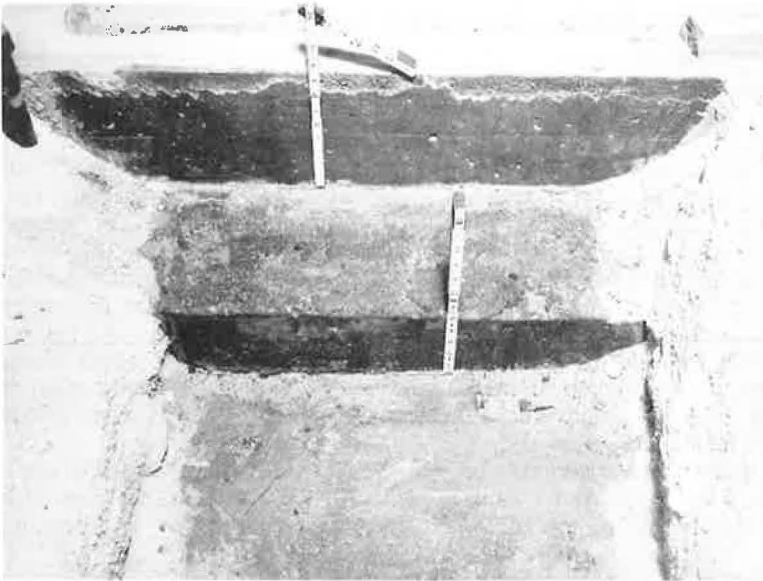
Ledge of 5-in. cement-treated subbase (CTS) 1-ft beyond edge of 8-in. concrete slab.
